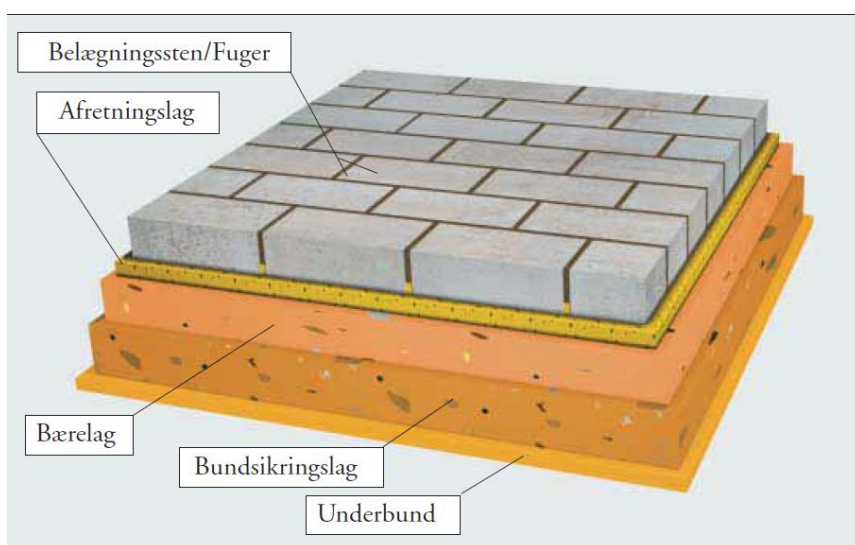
Schematic drawing of the concrete terrace, showing the different layers of the foundation. Image from Dansk Beton. See text for details.
